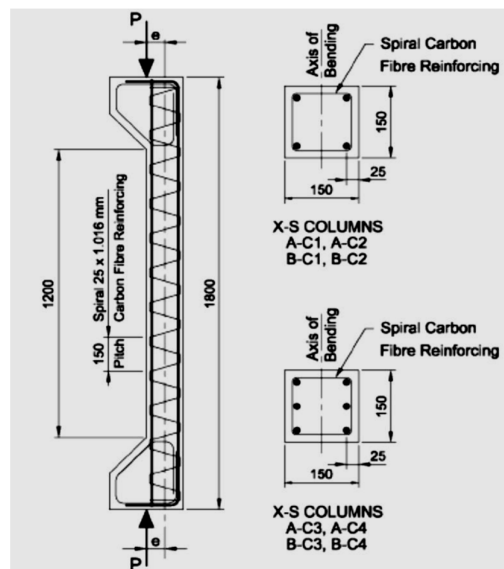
Dimensions and specimens reinforcement details (Tikka et al.,2010)
